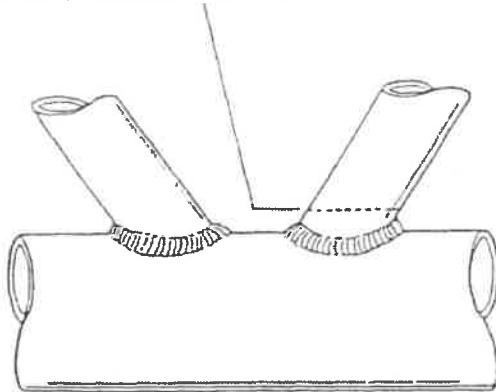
Cutting Off Damaged Tubular Lacings
